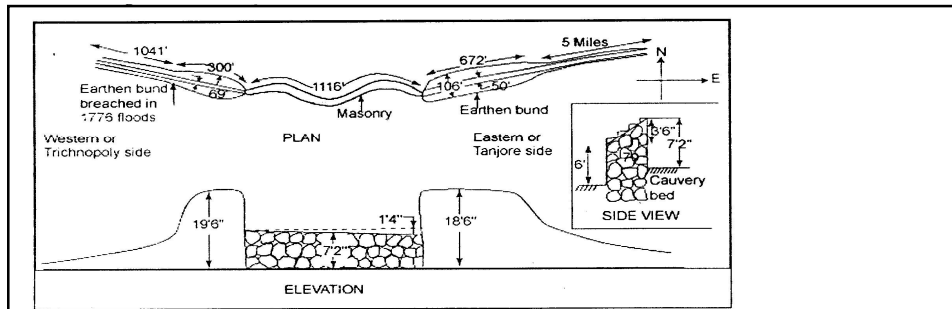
Plan and Elevation of Kallanai based on the 1777 description (not to scale)
